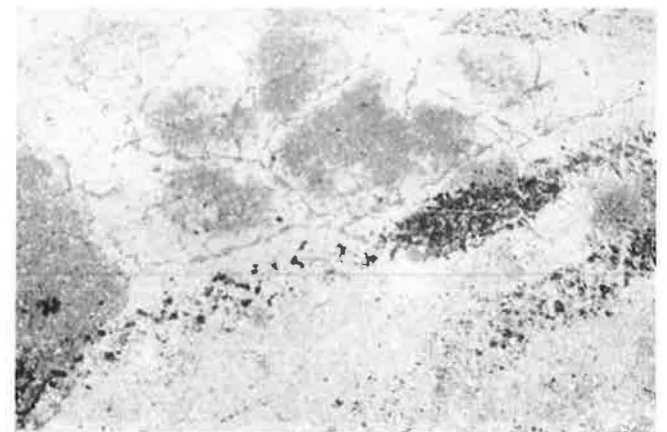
Close-up view of cracked PCC pavement.
